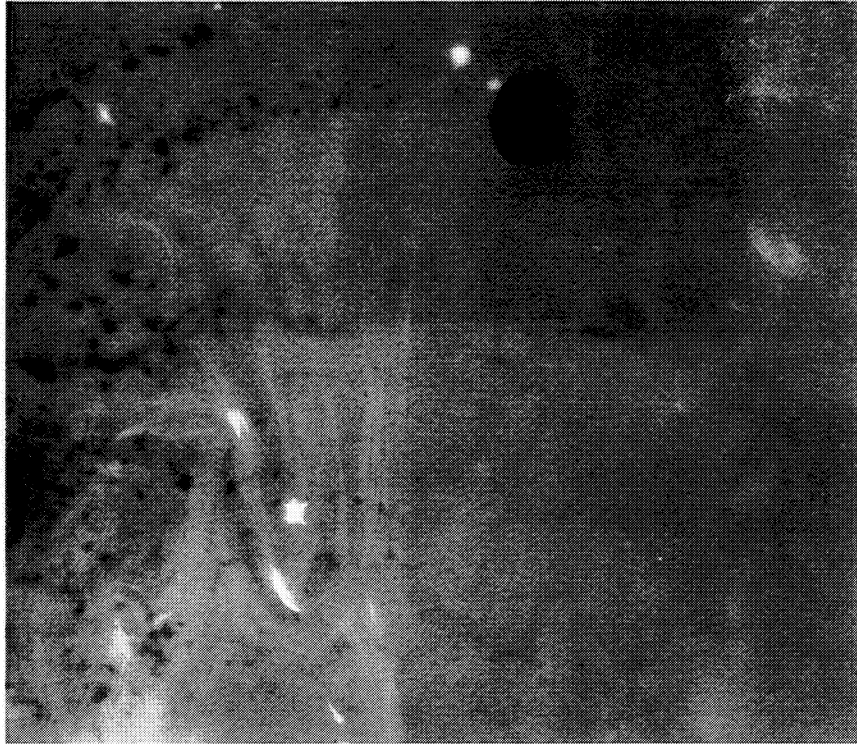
Behind Wall Debris Pattern for Test 7698-1
